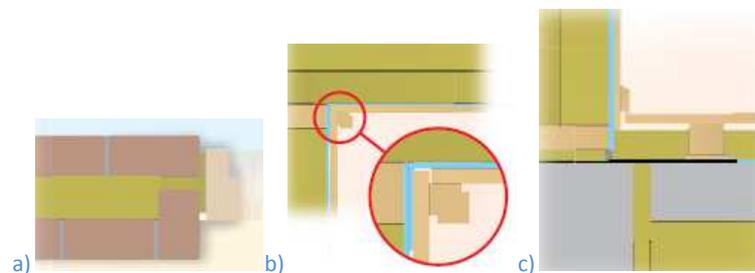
Tightening: a) wall/window, b) roof/wall c) wall/foundation (23).
